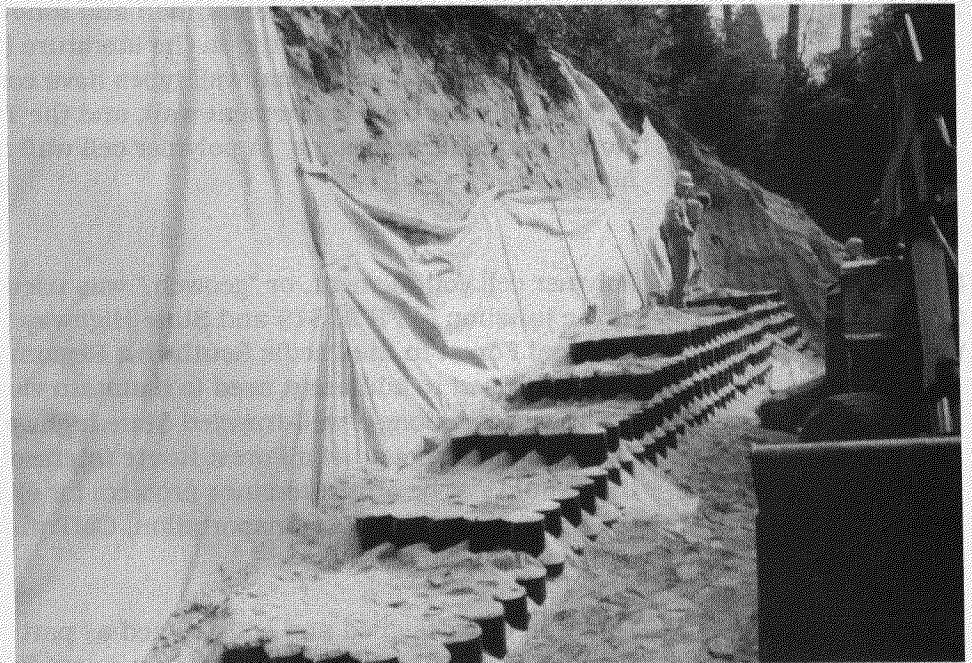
Backfilling of polymer cell confinement gravity wall.
